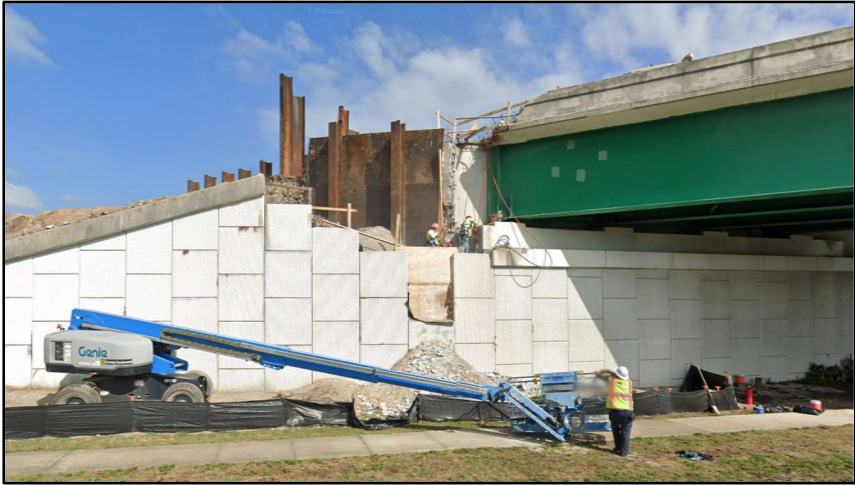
Temporary Retaining Wall, Pre-Excavation (Source: Google Street View)
